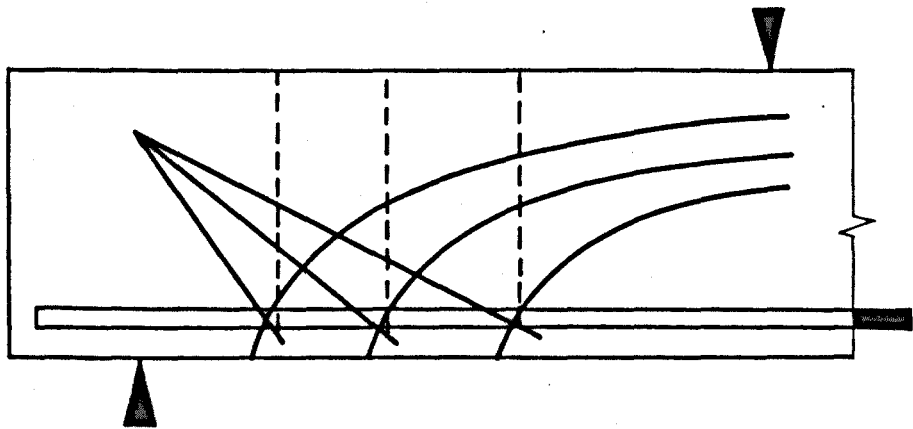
ACTION OF STIRRUPS PROPOSED BY KANI
